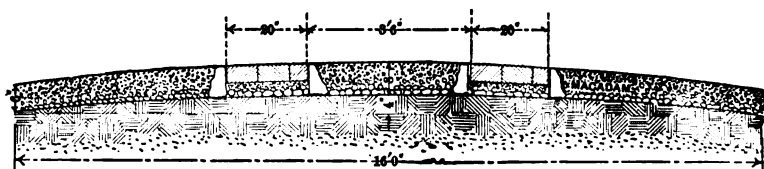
C.—CROSS-SECTION MACADAM ROAD WITH BRICK TRACKWAY.
